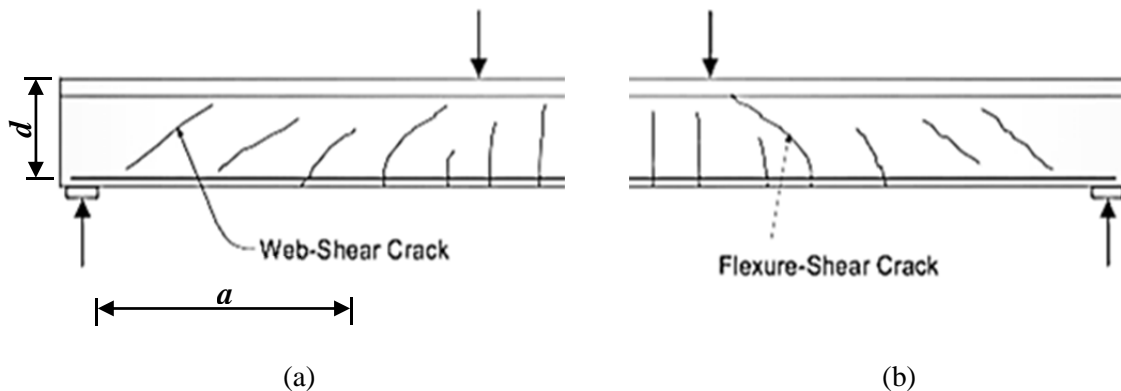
Typical crack patterns in reinforced concrete beams in shear: (a) web shear crack, (b) flexure-shear crack.
